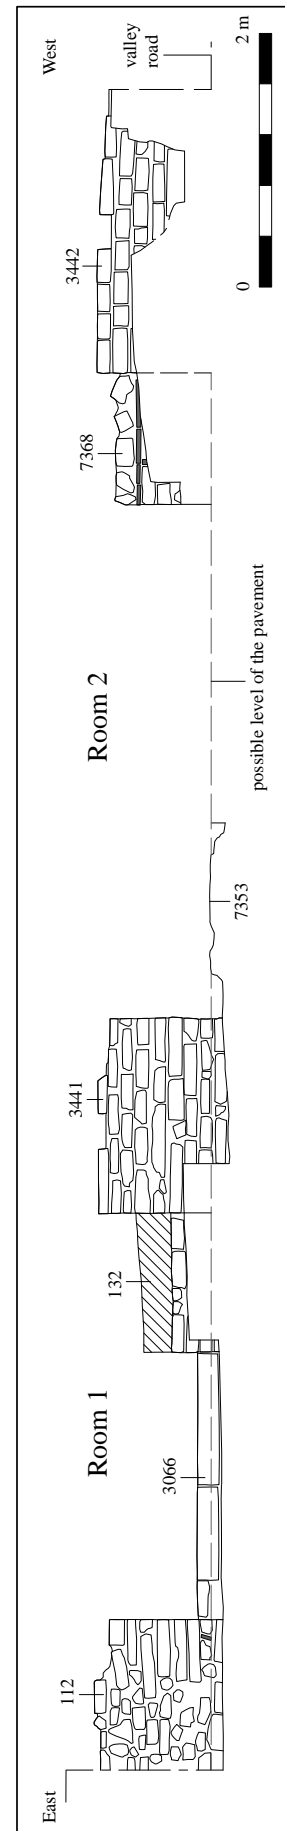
North-facing elevation of the northern wall of Building 4 showing blocking walls 132 and 7368 built across the entrances of Rooms 1 and 2
